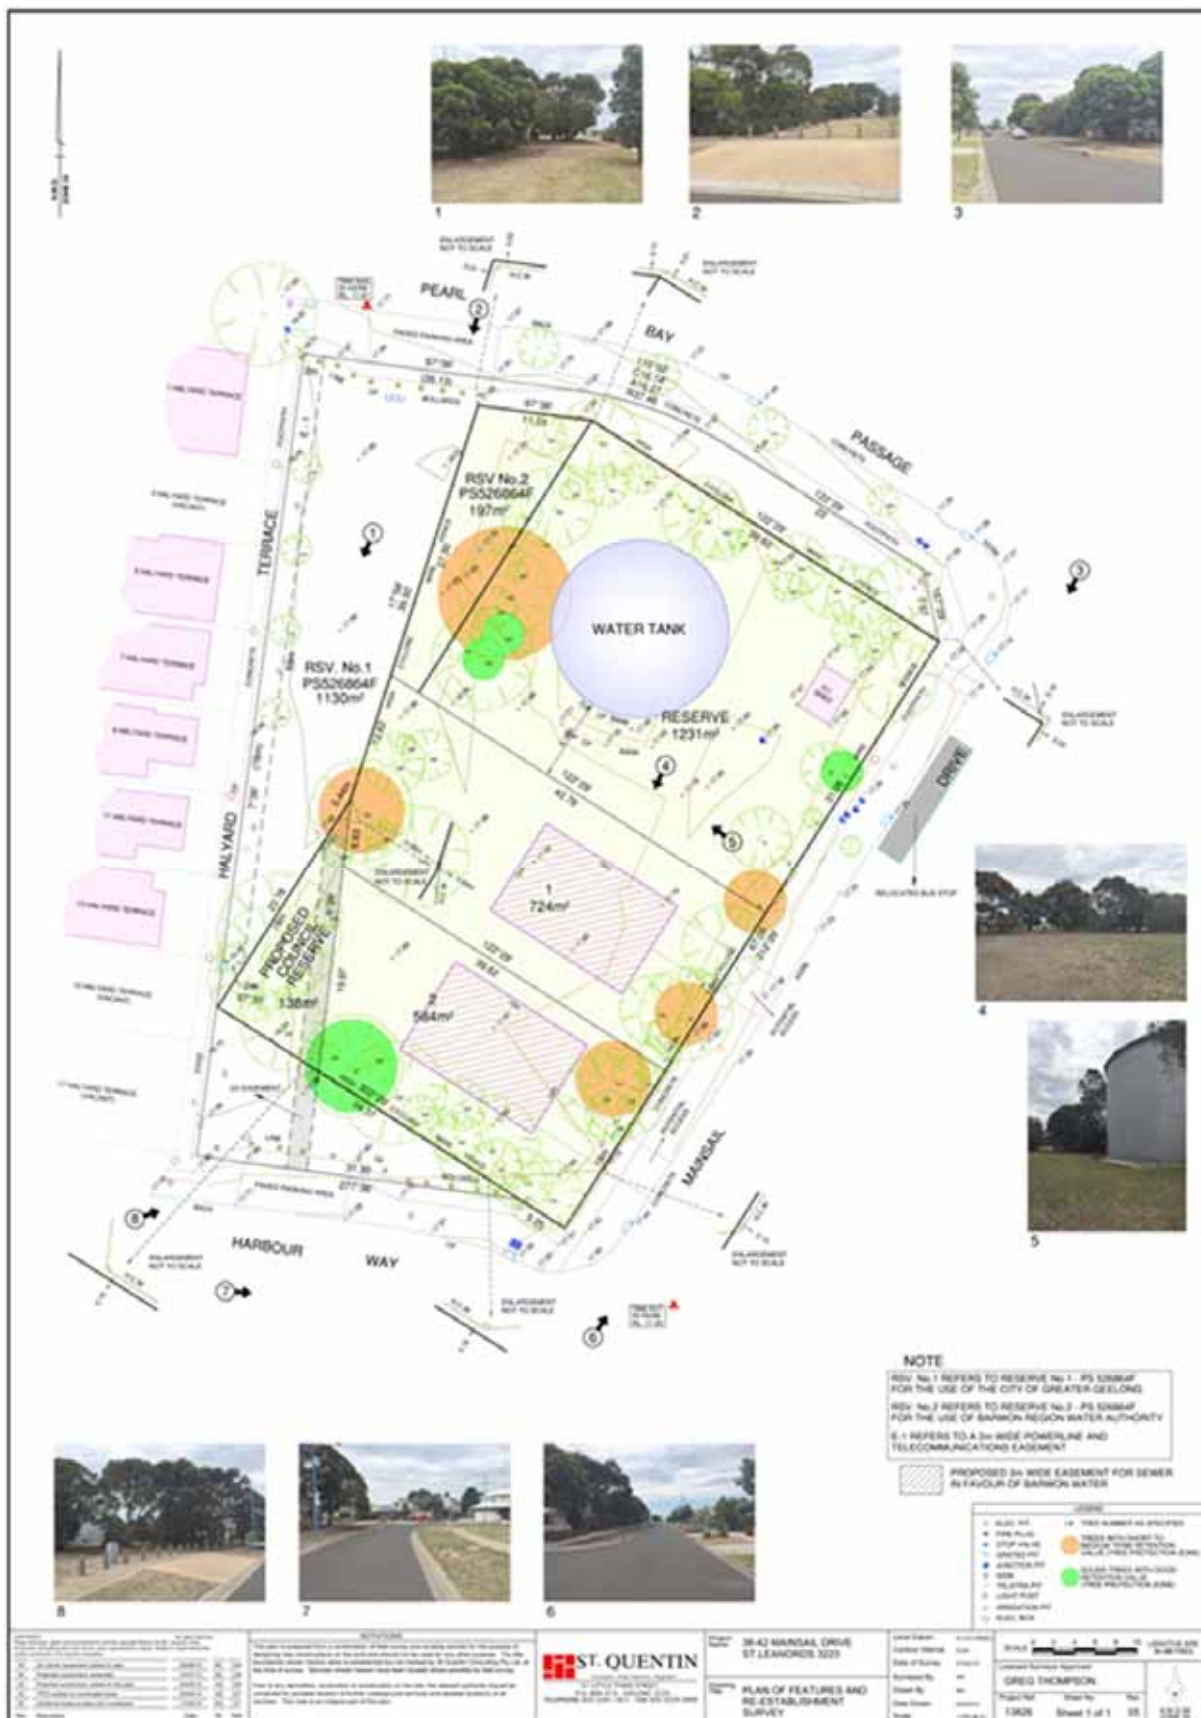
Proposed Plan of Subdivision (PA 762/2015)
